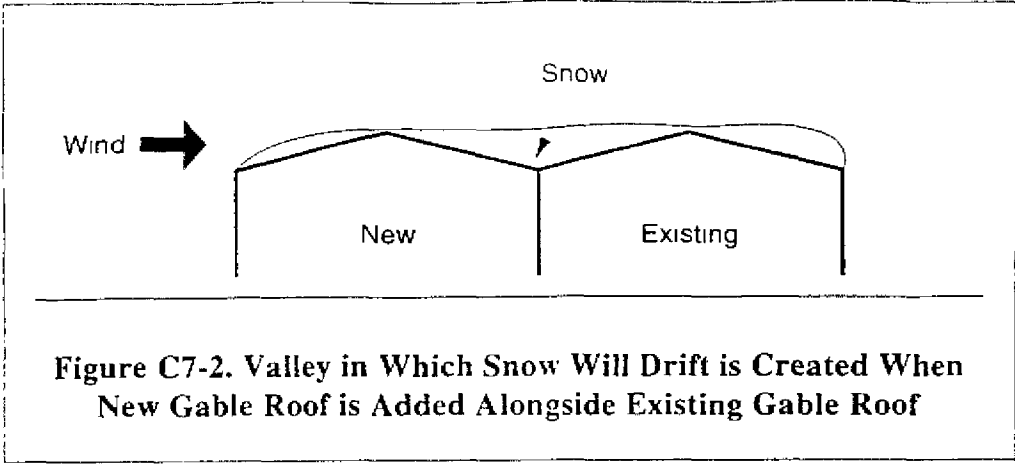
Valley in Which Snow Will Drift is Created When New Gable Roof is Added Alongside Existing Gable Roof
